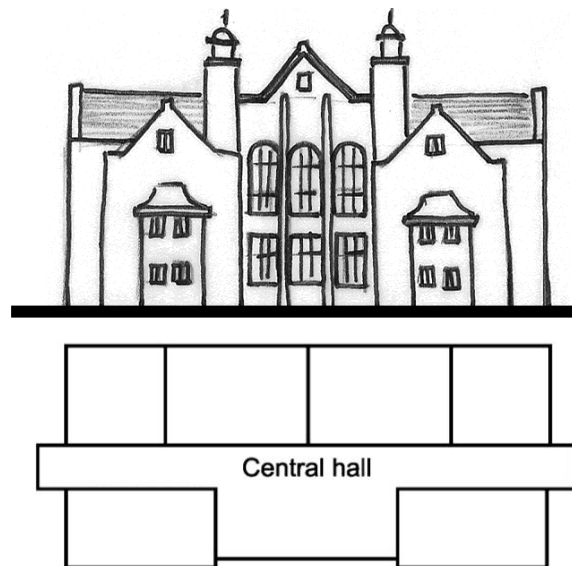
Example of a typical board school: elevation and diagrammatic plan.
